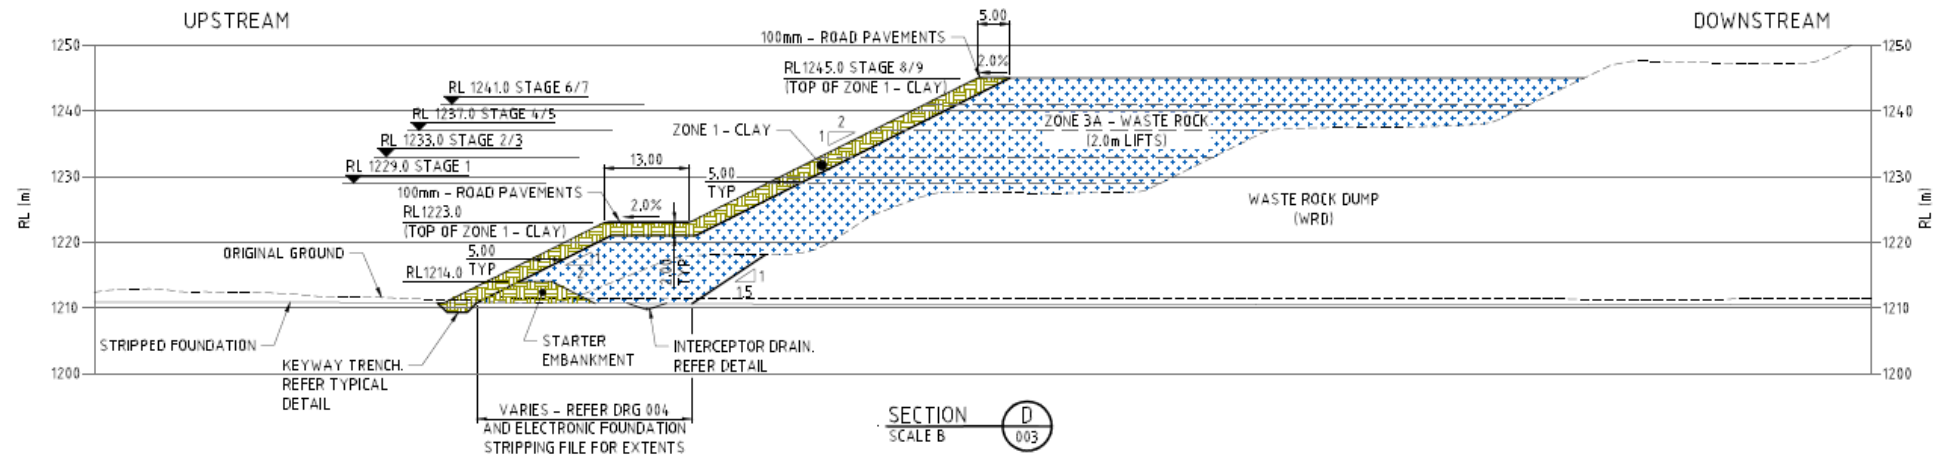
Northern expansion of IWL – typical embankment cross section adjacent to the Northern WRE
